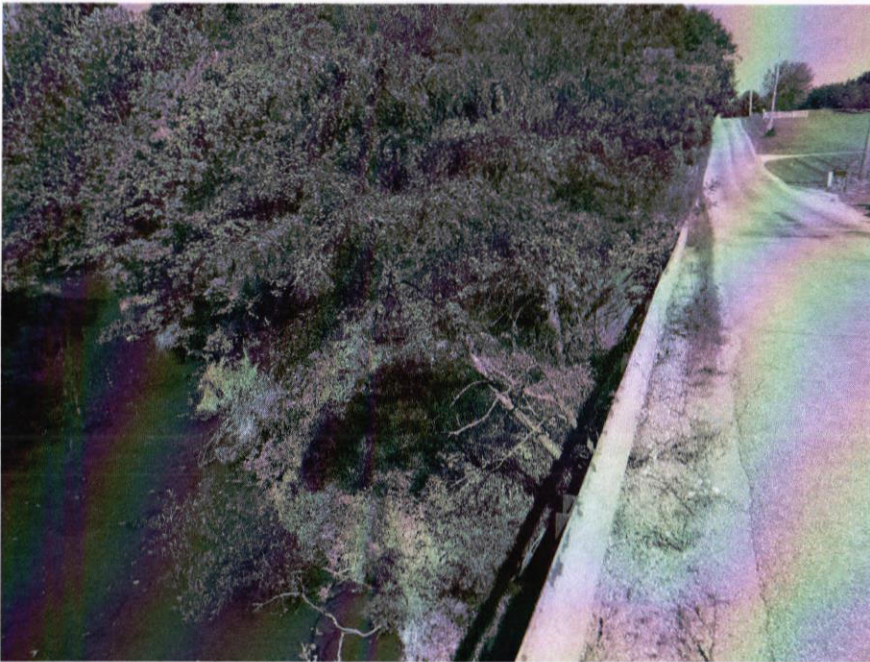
Facing northwest from the bridge over Bull Fork Salt Creek.
